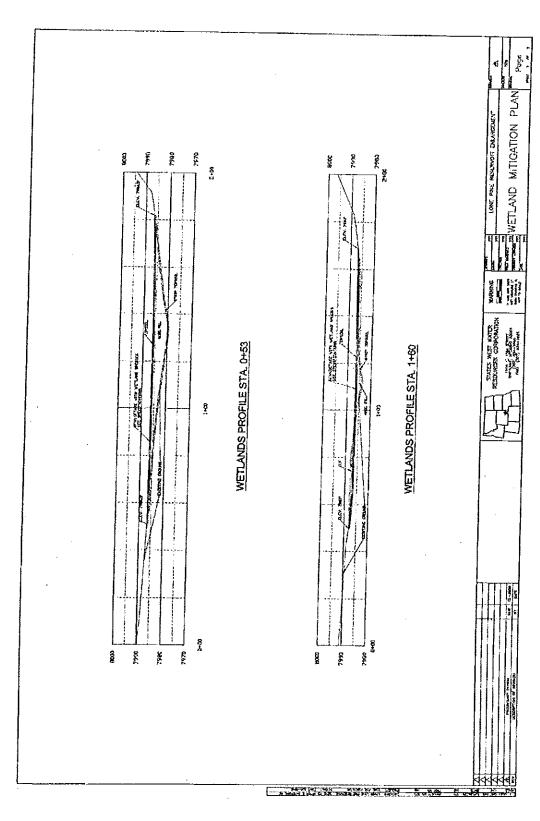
Proposed construction plan for the Crystal Lake Reservoir Expansion Project wetland creation site
